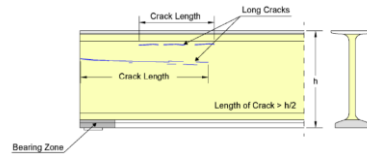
Longitudinal horizontal cracks in NU girders
